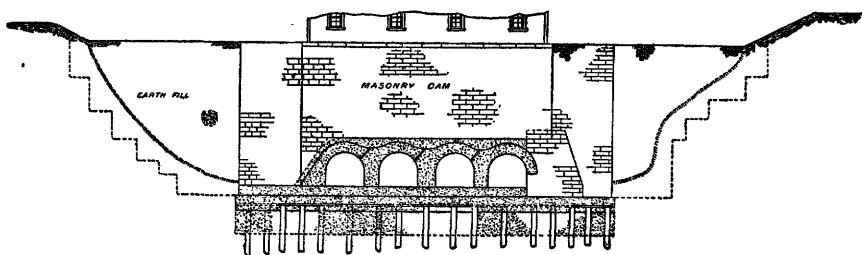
Cross section below masonry dam of Twin Lakes reservoir.
